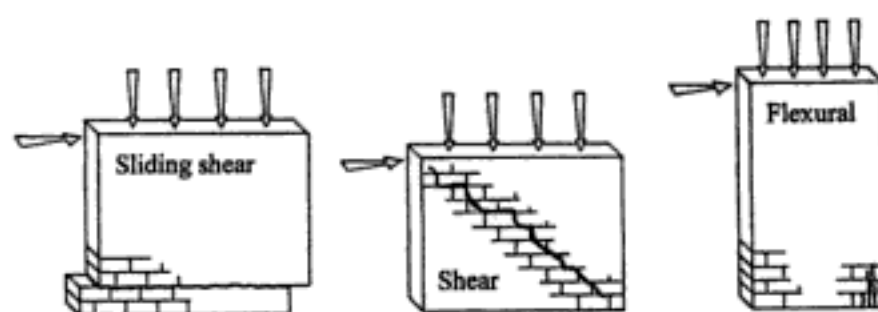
Typical failure modes of masonry walls, subjected to seismic loads.
